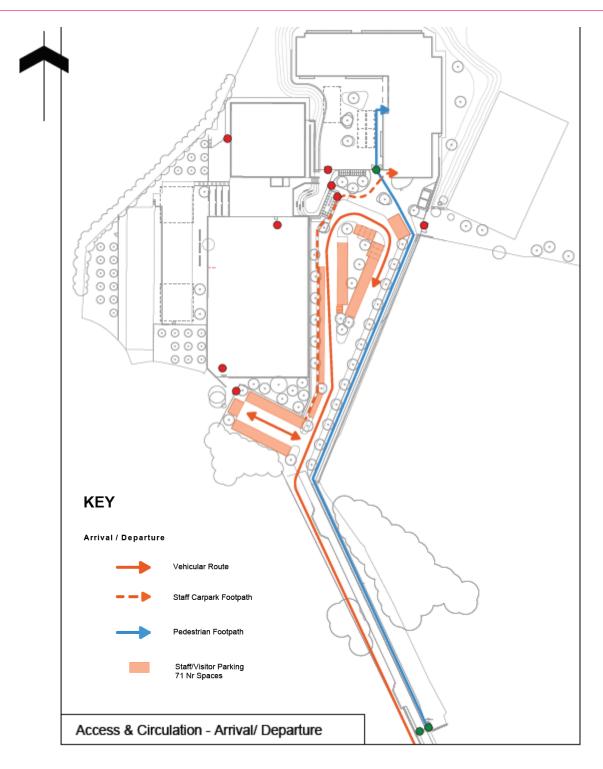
Access and Circulation of the Proposed Site Layout
